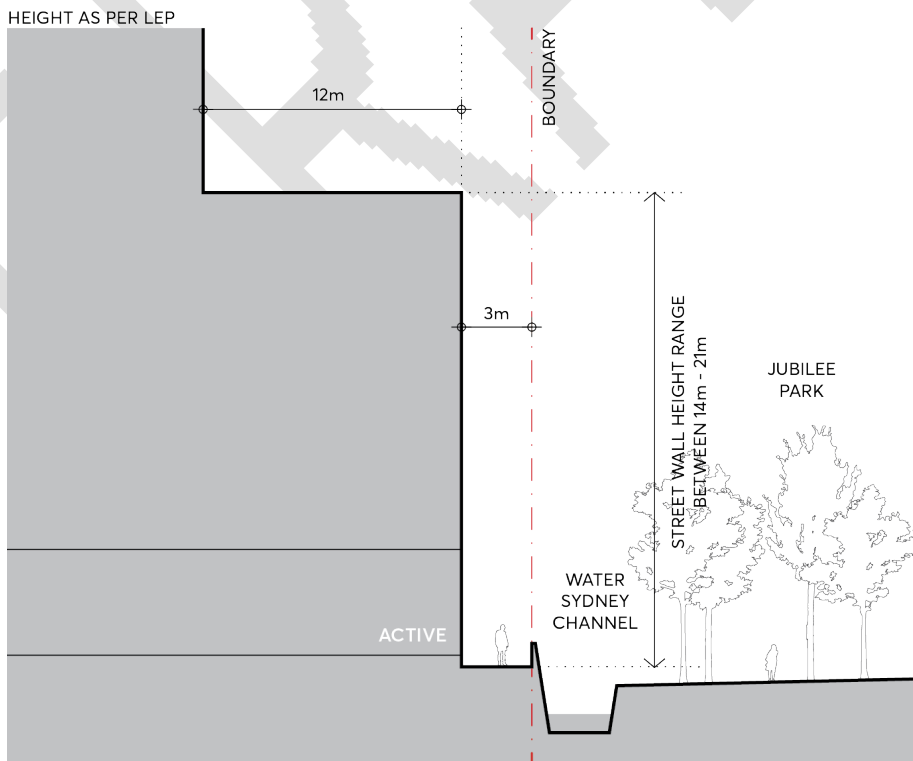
Jubilee Park Edge (Section F) Setbacks and Street Wall Height
